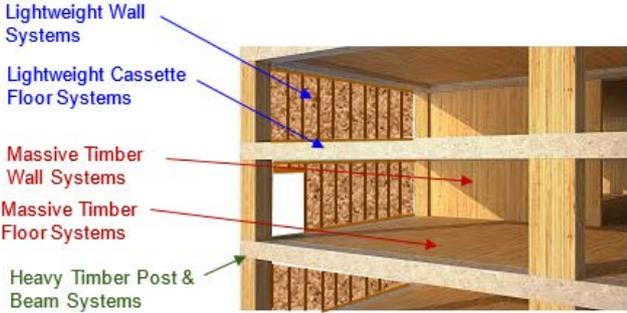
Typical timber-based systems used in mid-rise timber buildings
